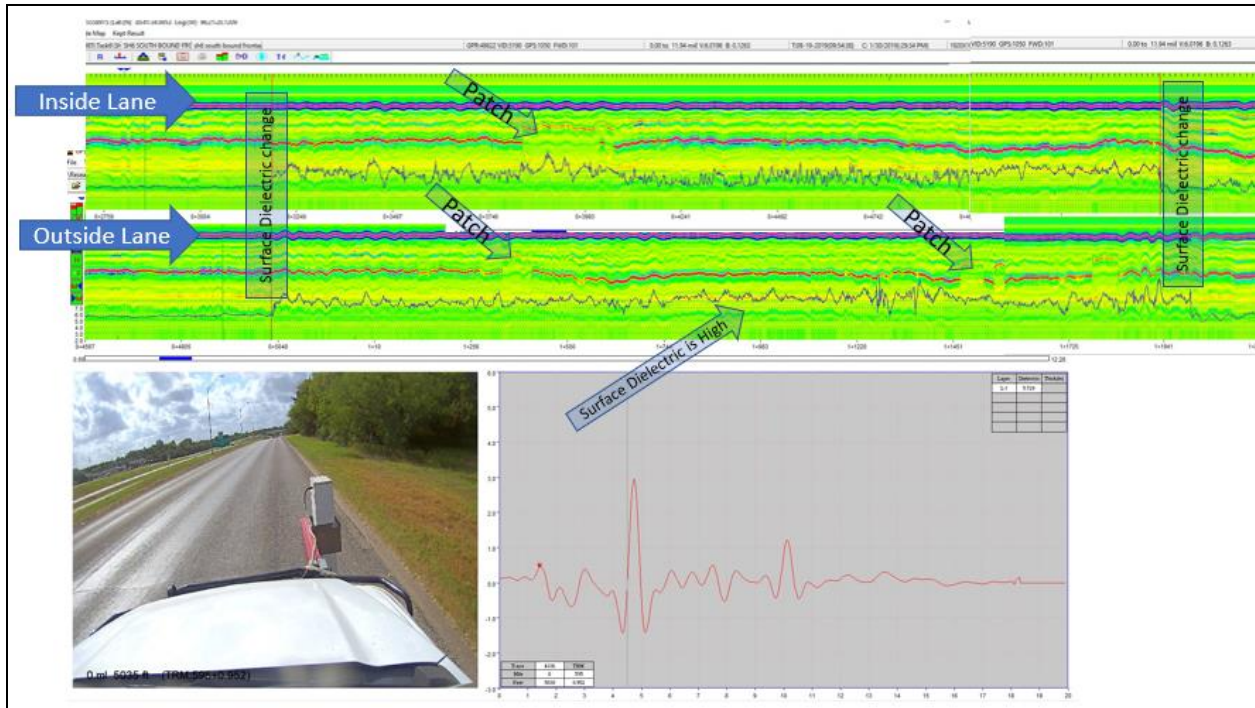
SH 6 Southbound Frontage Road Ground-Penetrating Radar in Repair Area 1.
